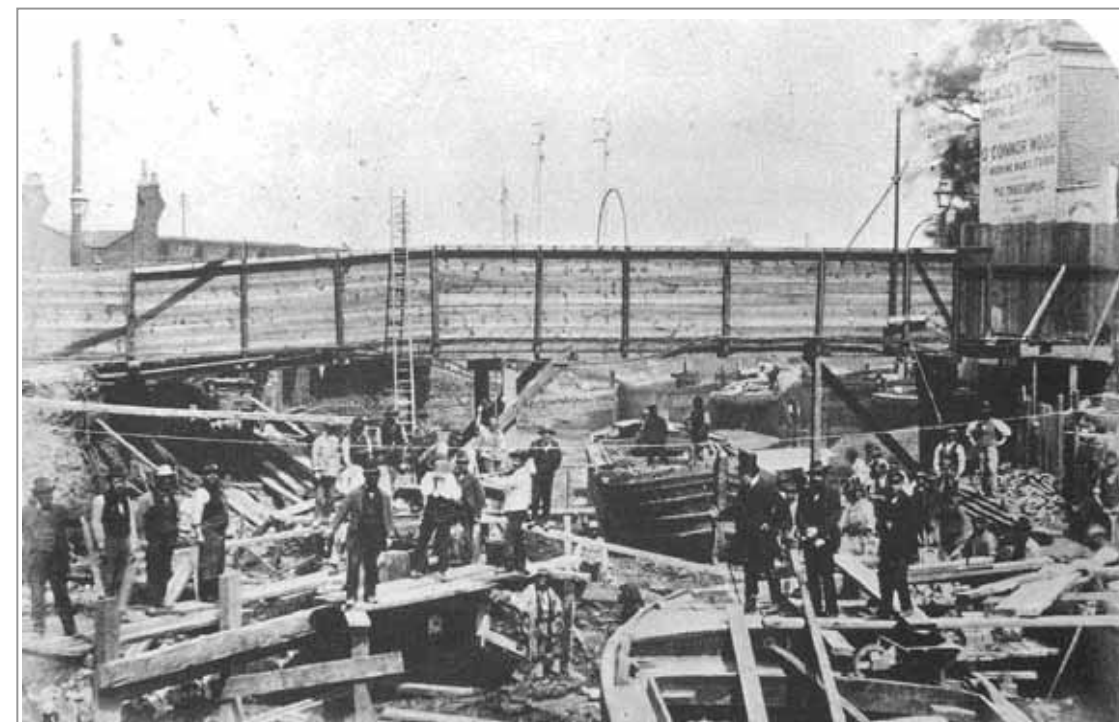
The newly constructed Hampstead Road Bridge, 1877. In the background, on the left, Nos. 1-2 Chalk Farm Road. Looking north-east, note the absence of trees.
